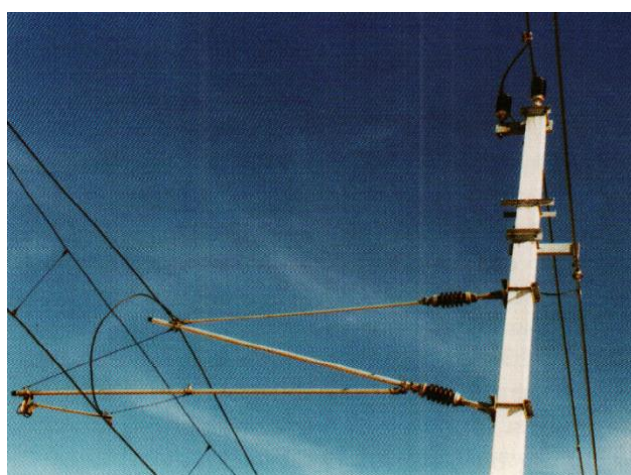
Pole with OBB cantilevers on the Otzal – Haiming section, Austria
